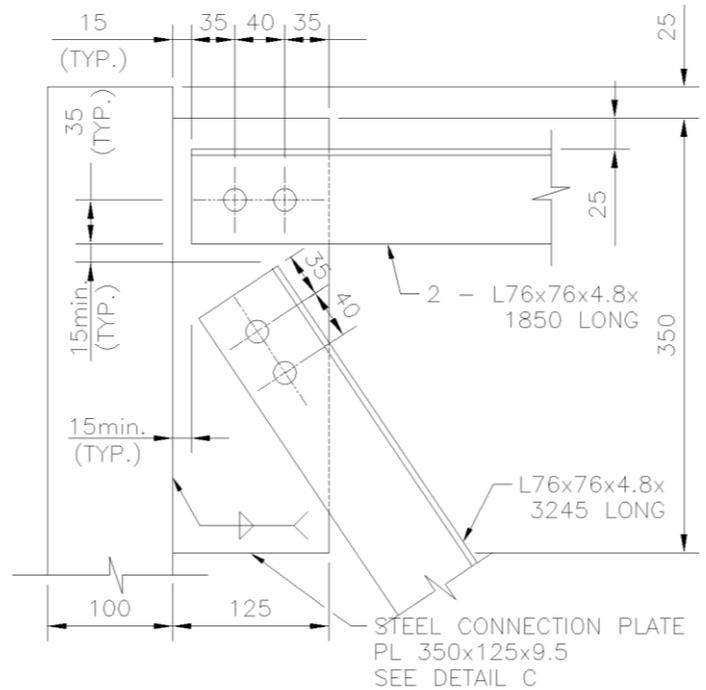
Connection Detail of RHS Columns and the Angle Bracing for the Tamkal Suspension Bridge
